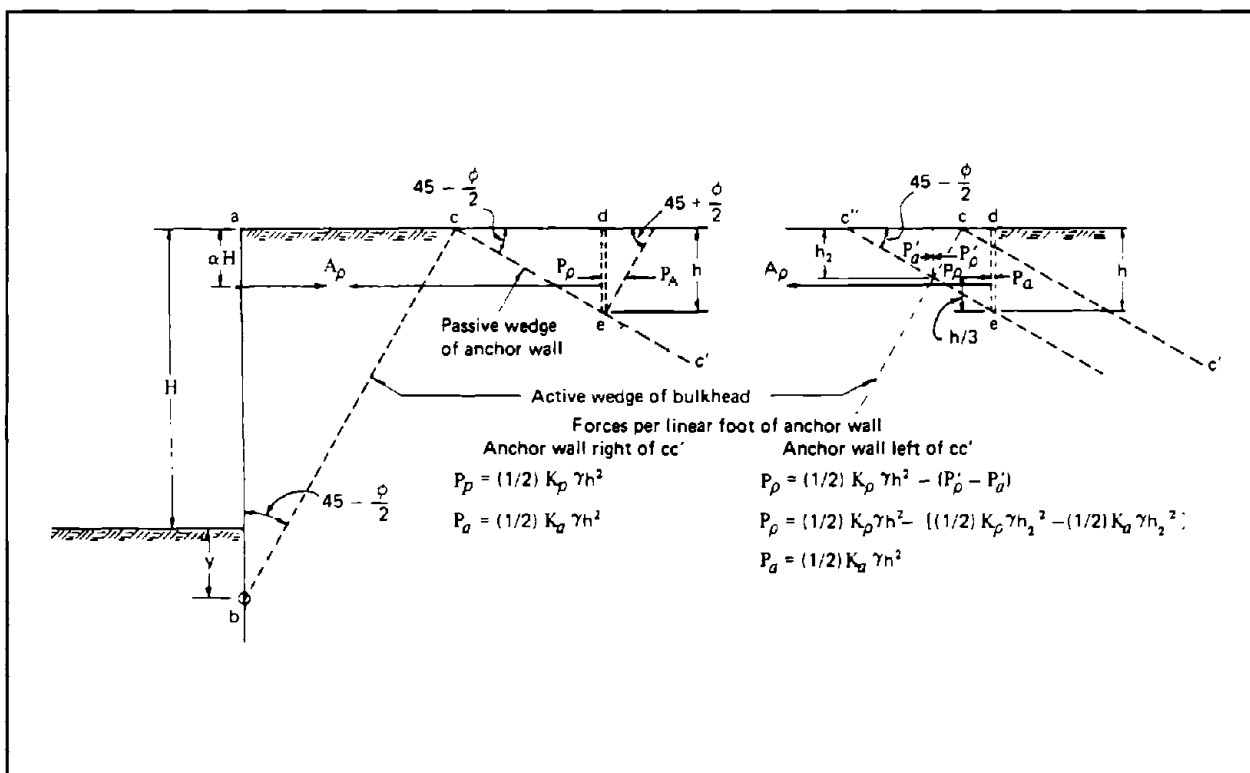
Continuous anchor wall—earth pressure distribution (after NAVFAC, 1982).
